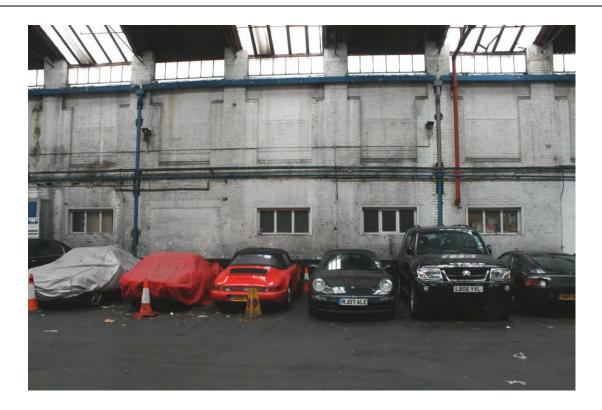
Inserted ground floor windows and blocked double doorway on the north side of building, looking north-west (72FmLa D100 033)
